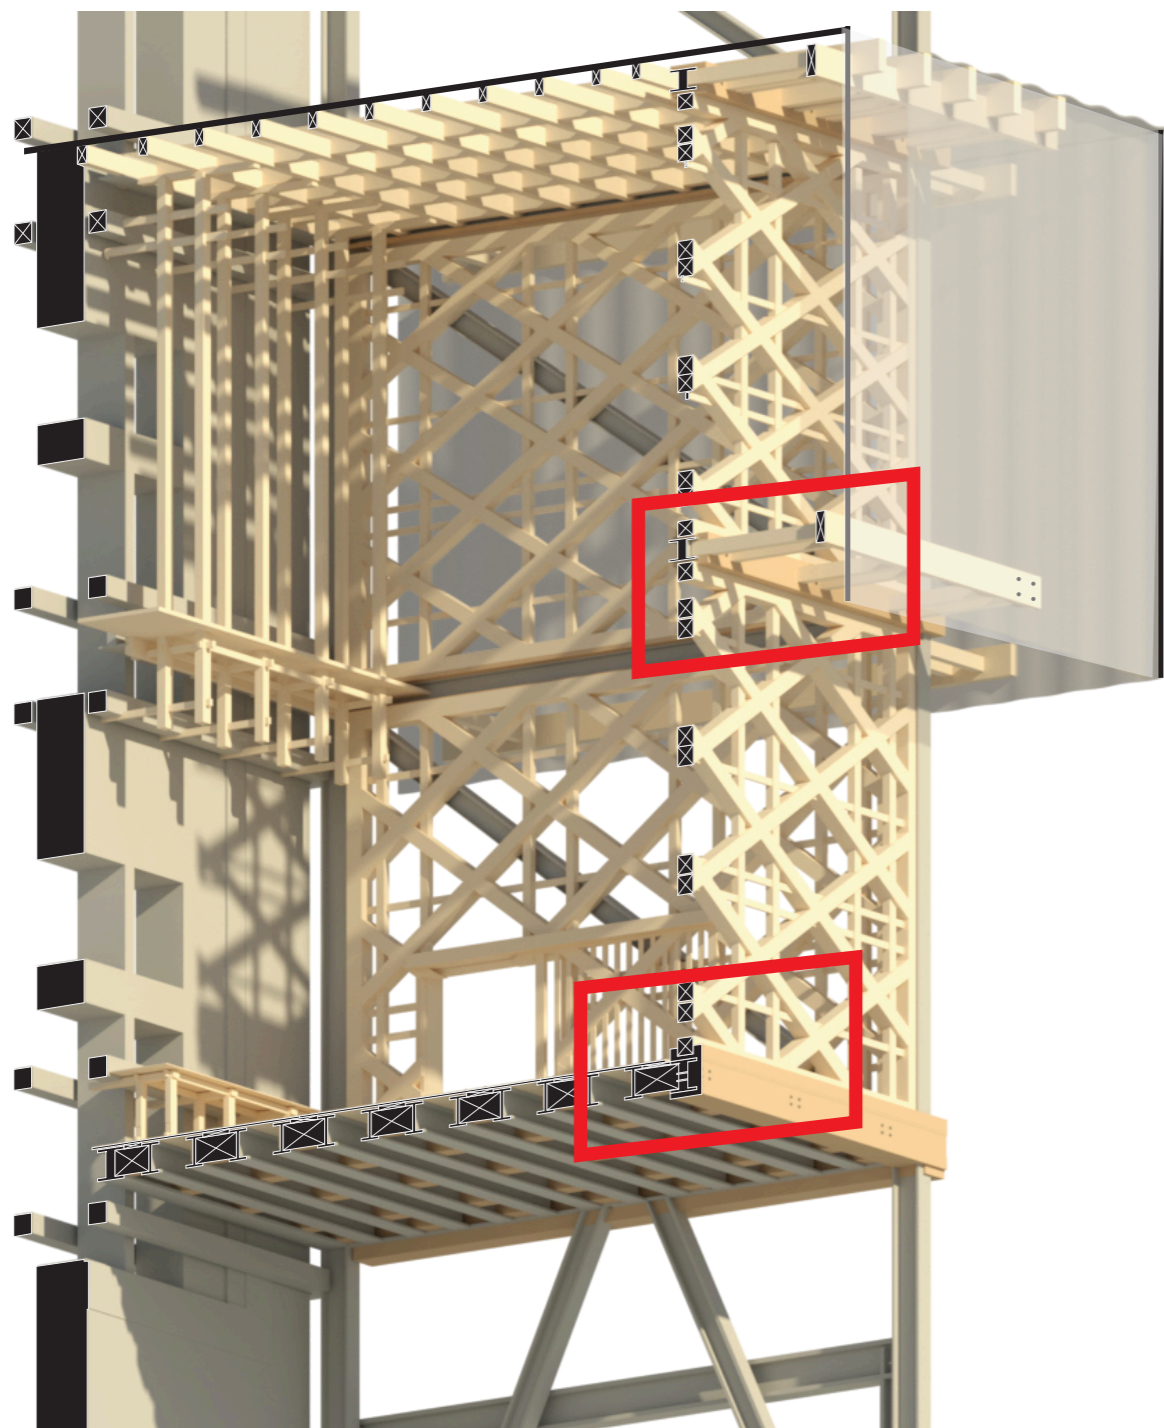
1:20 Detailed sectional perspective drawing of the proposed Lamp Tower.
